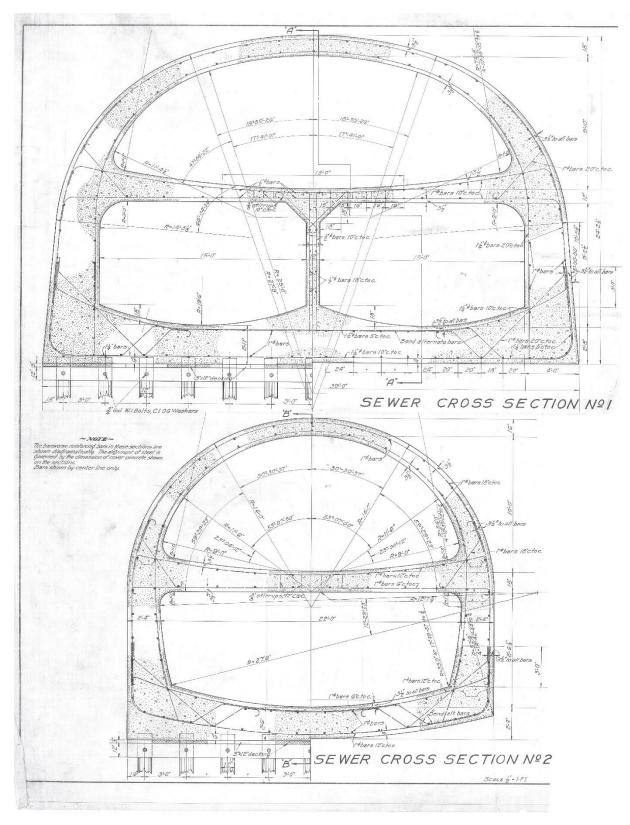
CSO Outfall BB-006 Cross Sectional Views
